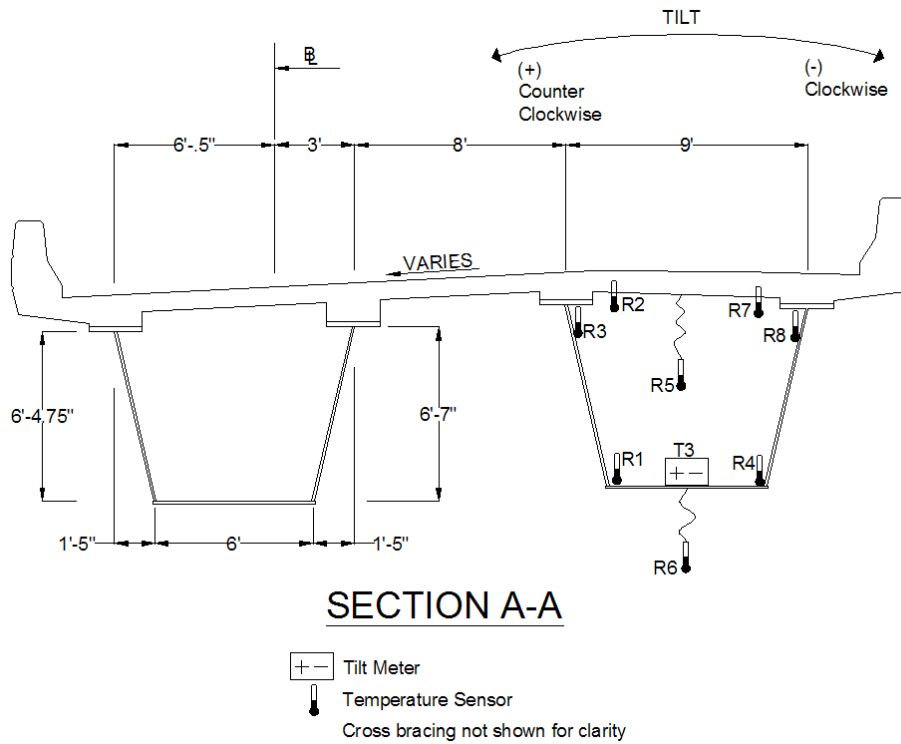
Typical Cross Section of Steel Box Girder Bridge
